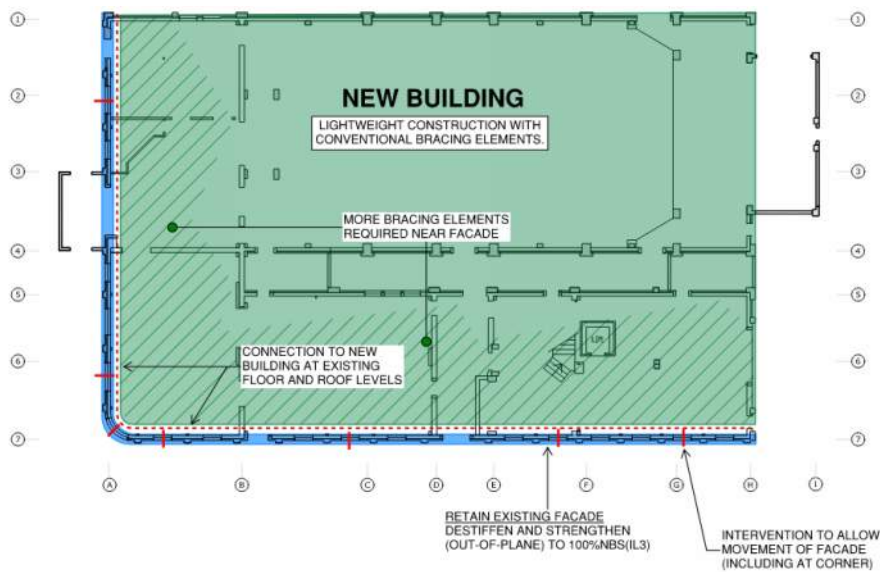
Façade Retention Option – Non-Structural Façade
